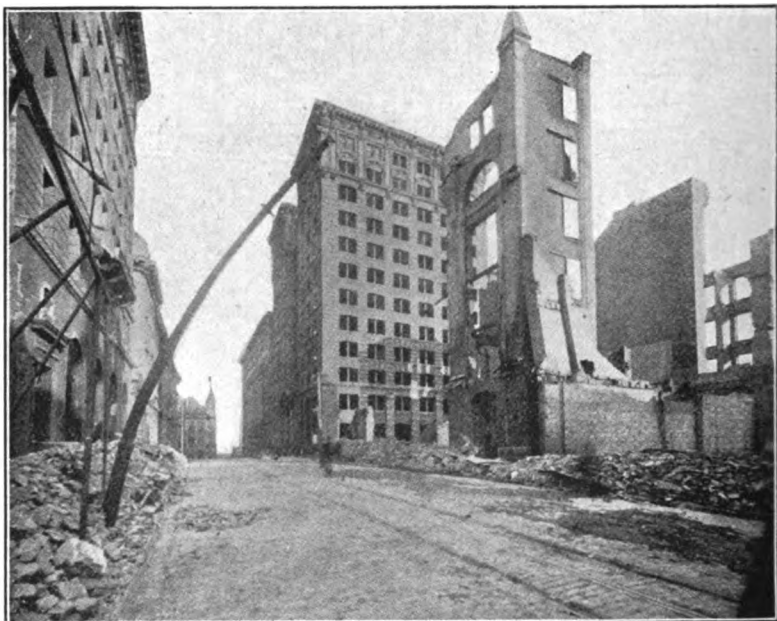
Calvert Building, beyond the ruins on the right. Baltimore Fire, 1904. A steel and tile building of fireproof construction. All structural members are absolutely intact. This building received, in some of its upper storeys, the maximum of heat noted anywhere about the burned district.
